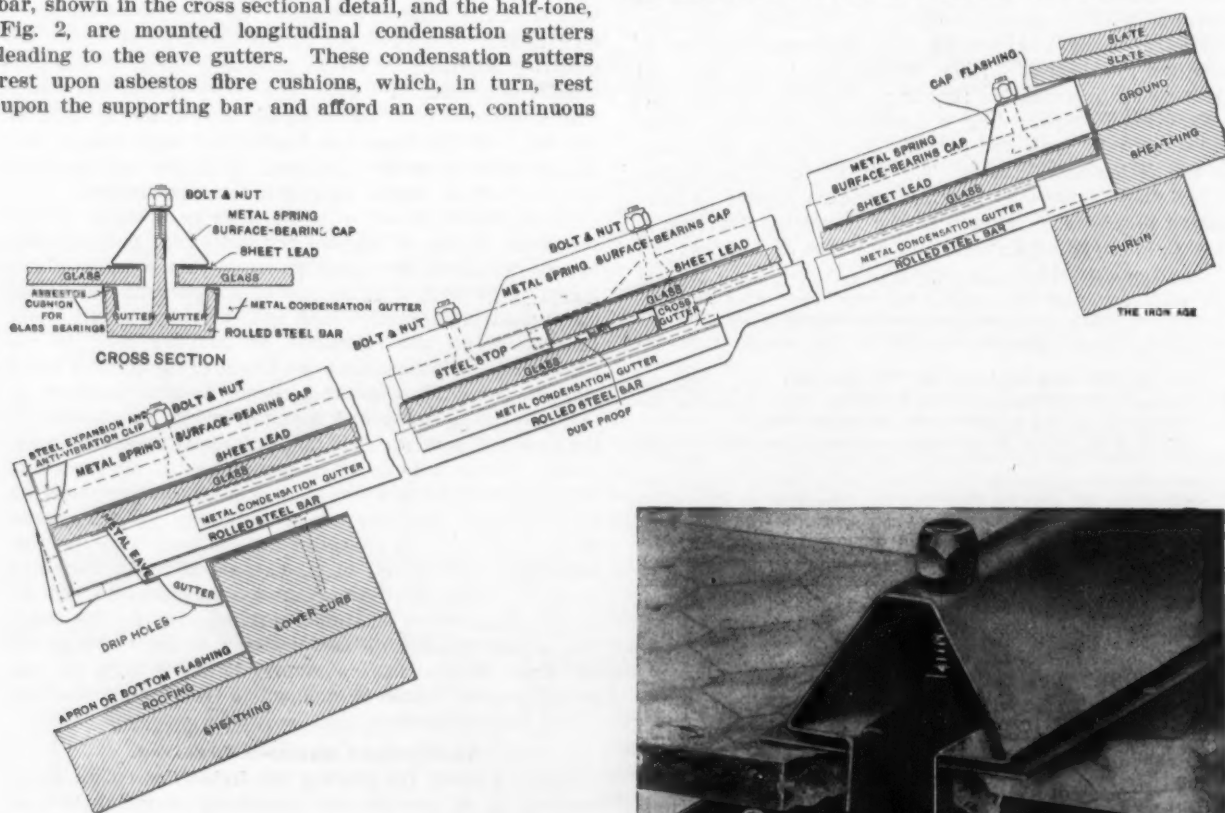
Longitudinal and Cross Sectional Details of the System of Steel Puttyless Glazing Construction Controlled by the National Ventilating Company, New York.
